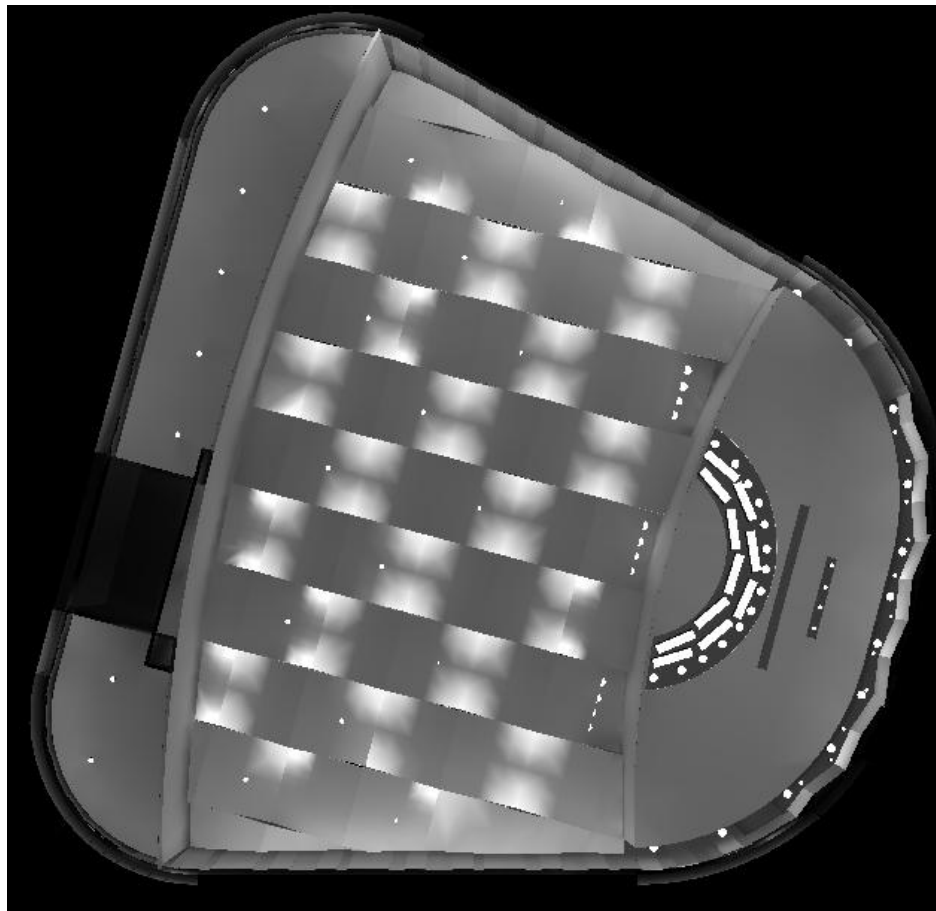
Council Chamber Reflected Ceiling Plan Rendering
